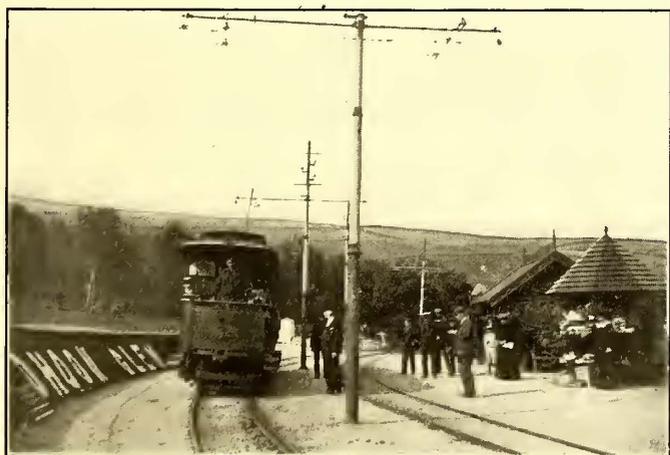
TYPICAL OVERHEAD CONSTRUCTION
